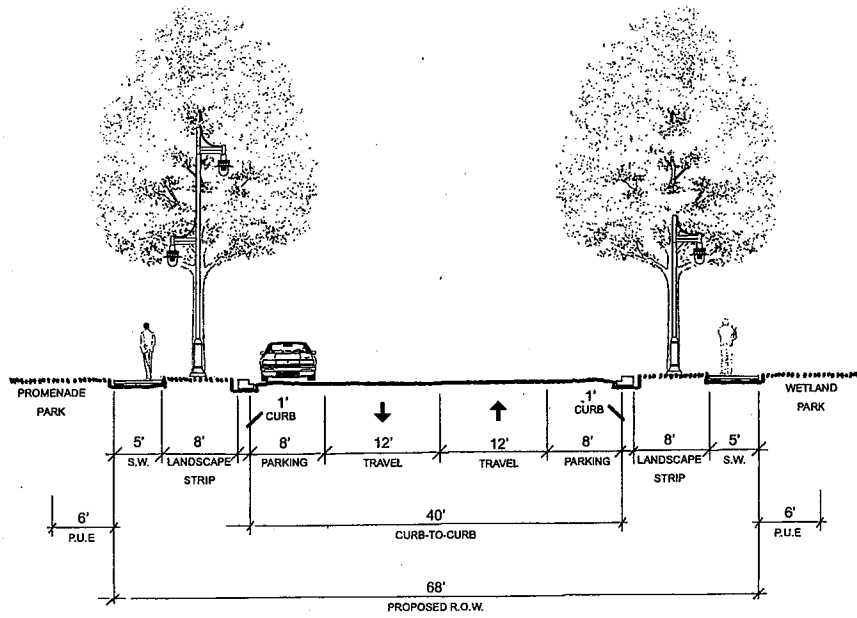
D.New.l: Harbor Way Cross Section at Park (3)
